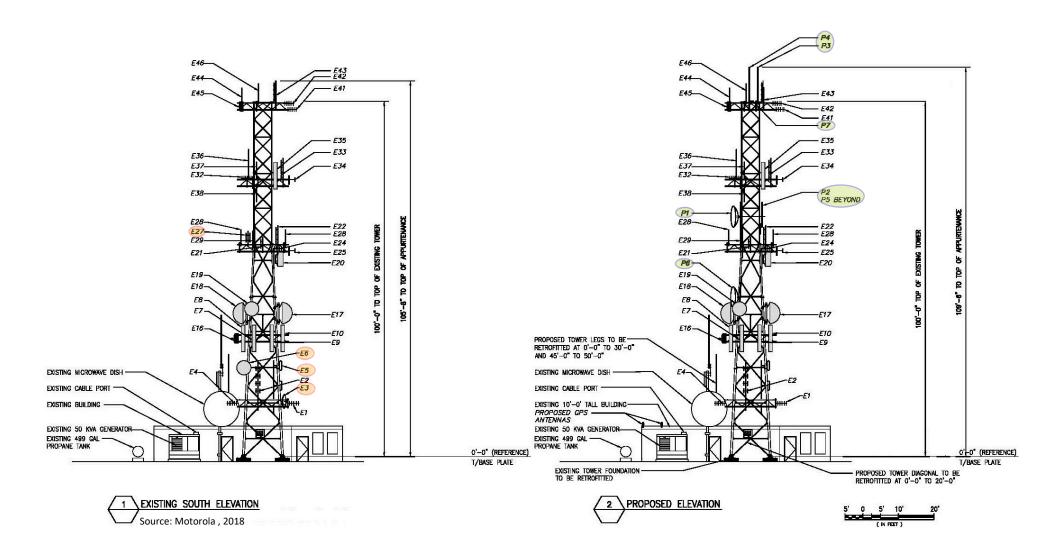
Site 11 - San Pedro Ridge Existing and Proposed Elevations
